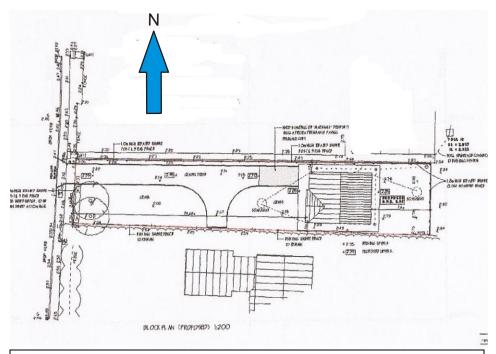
Block Plan Showing the Layout of the Proposed Development at an original scale of 1:200, (not to scale), (extract from Architects plan).
